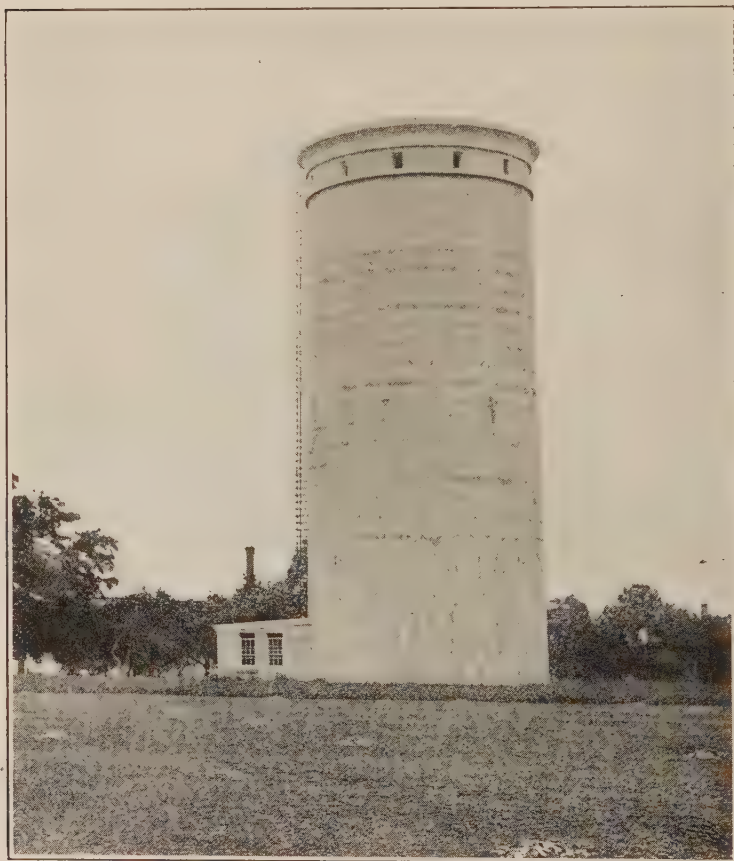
REINFORCED CONCRETE STANDPIPE.
